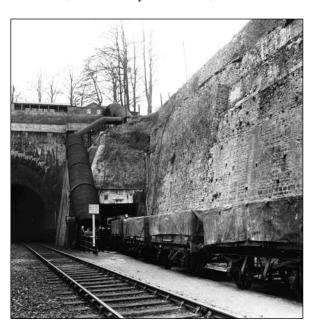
Historic image showing ammunition entering Tunnel Quarry and Box Tunnel entrance (© Nick McCamley)
